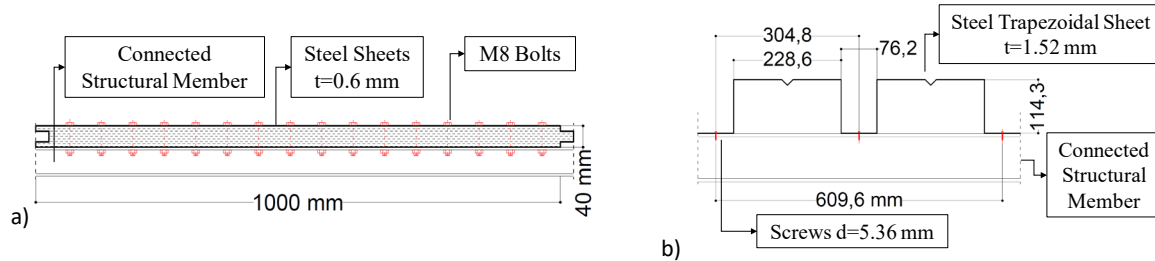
Cladding and roofing elements: (a) sandwich panel detail; (b) trapezoidal sheeting detail.
